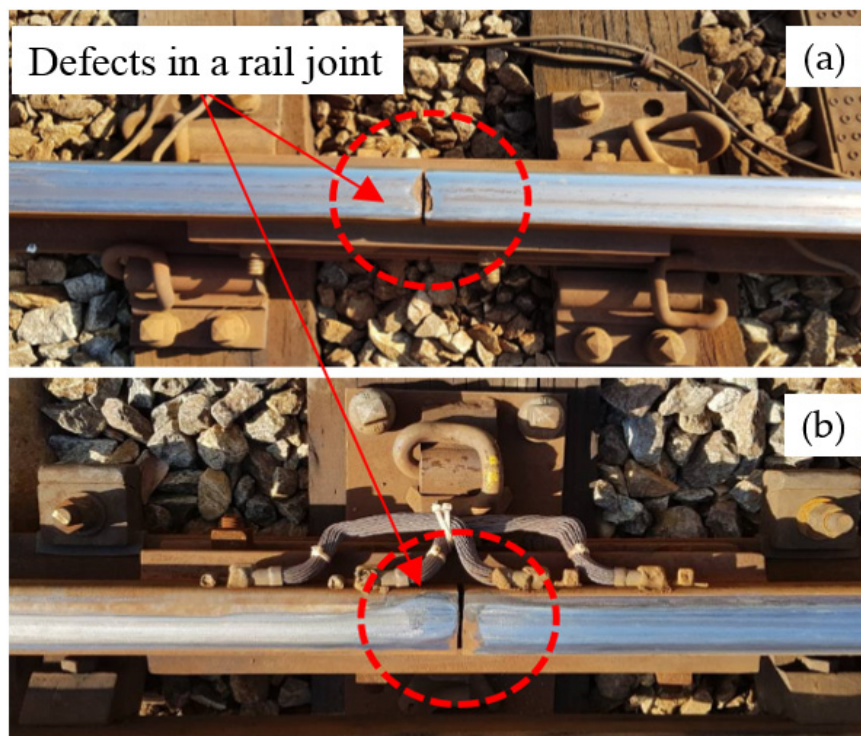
Photograph of typical defects by rail joint type. (a) Suspended joint; (b) supported joint.
